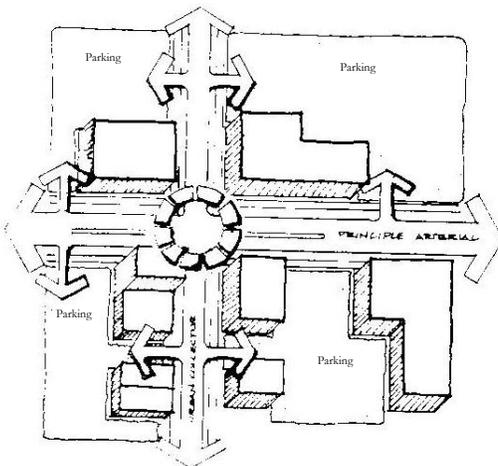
Buildings rather than parking lots, dominate the appearance of the downtown streetscape.
